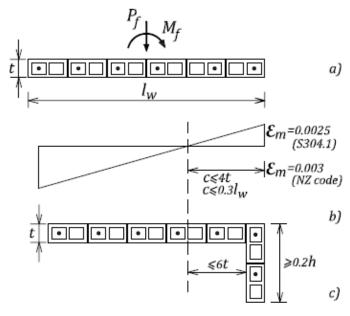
Neutral axis depth in ductile shear walls: a) rectangular (non-flanged) wall cross-section; b) corresponding neutral axis depth limits; c) flanged wall.
